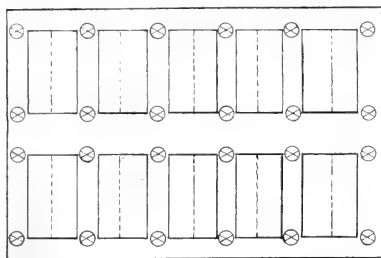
TYPICAL LAYOUT MAKING-UP ROOM.
